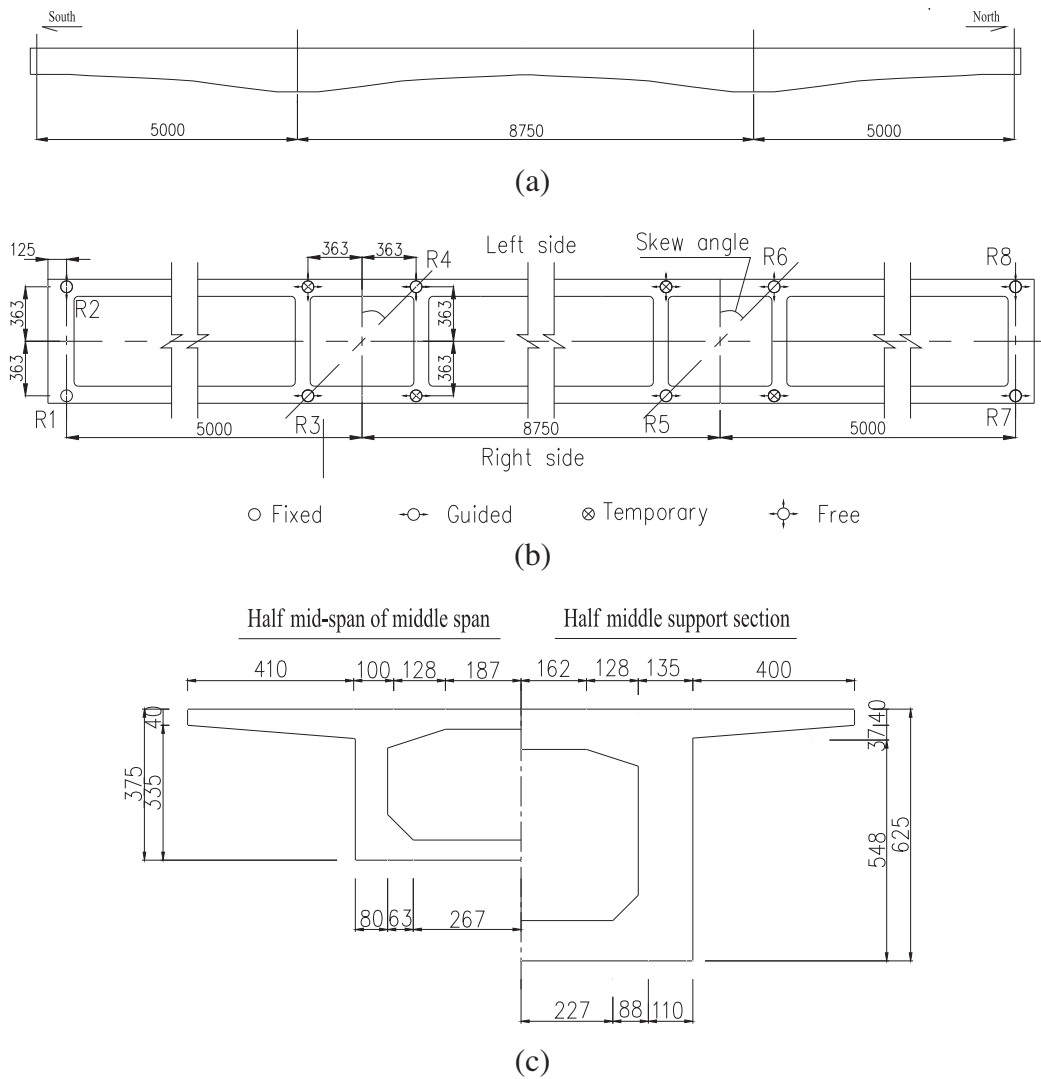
Model bridge: (a) elevation; (b) framing and support plan; (c) typical cross sections (units: mm).
